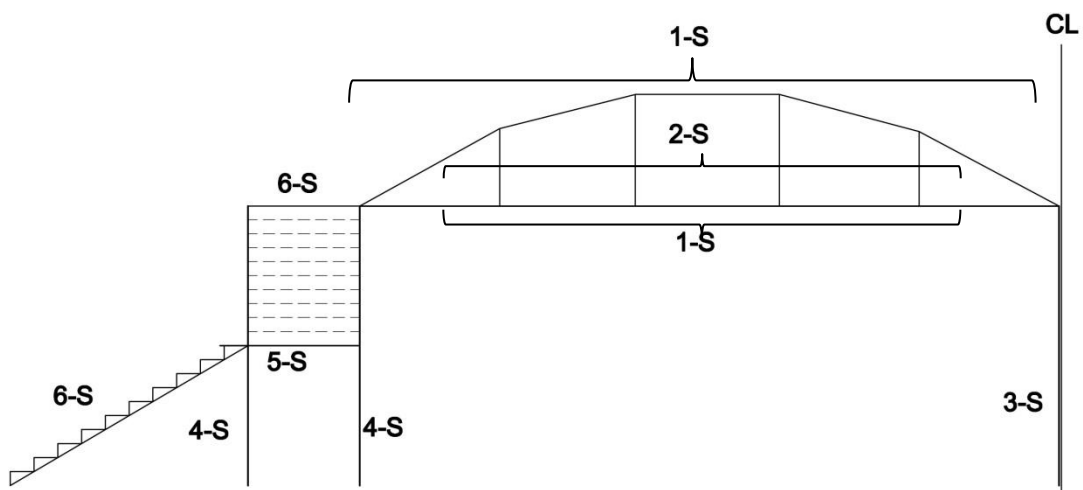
Section ID for elements of double span arch bridge (A4)
